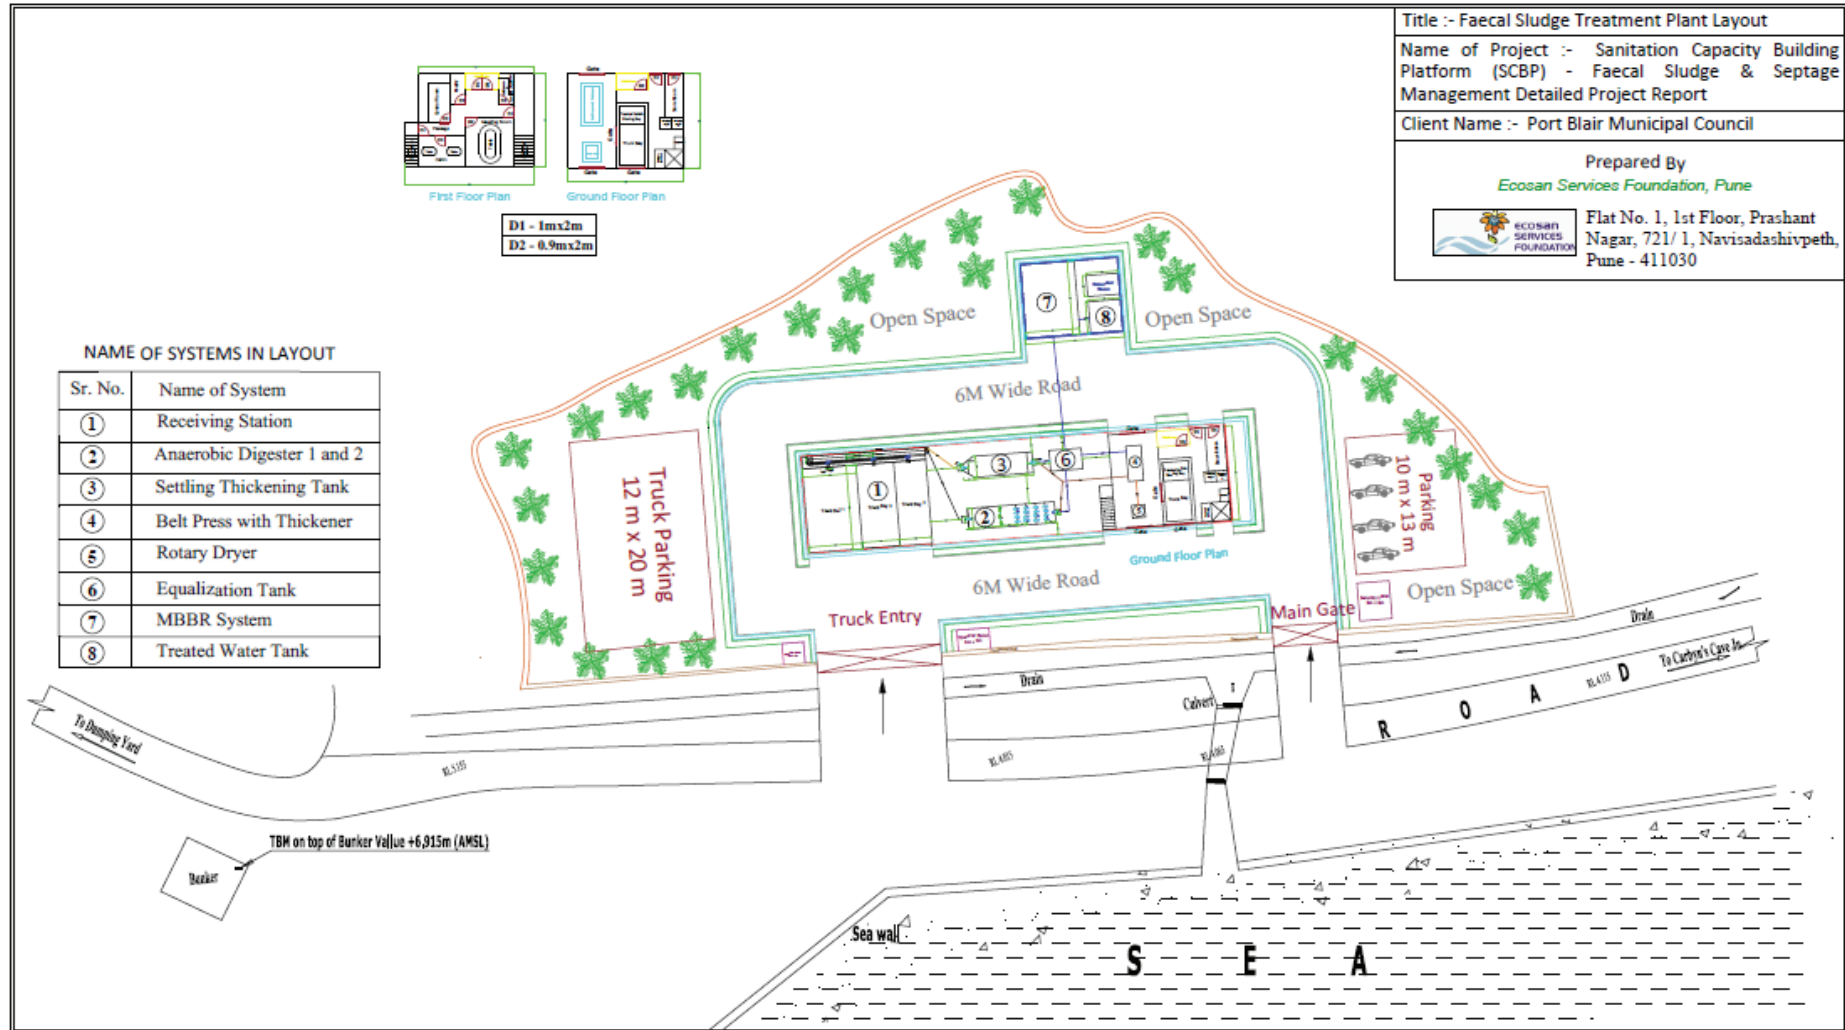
LAYOUT OF PROPOSED FAECAL SLUDGE TREATMENT PLANT (FSTP) SITE
